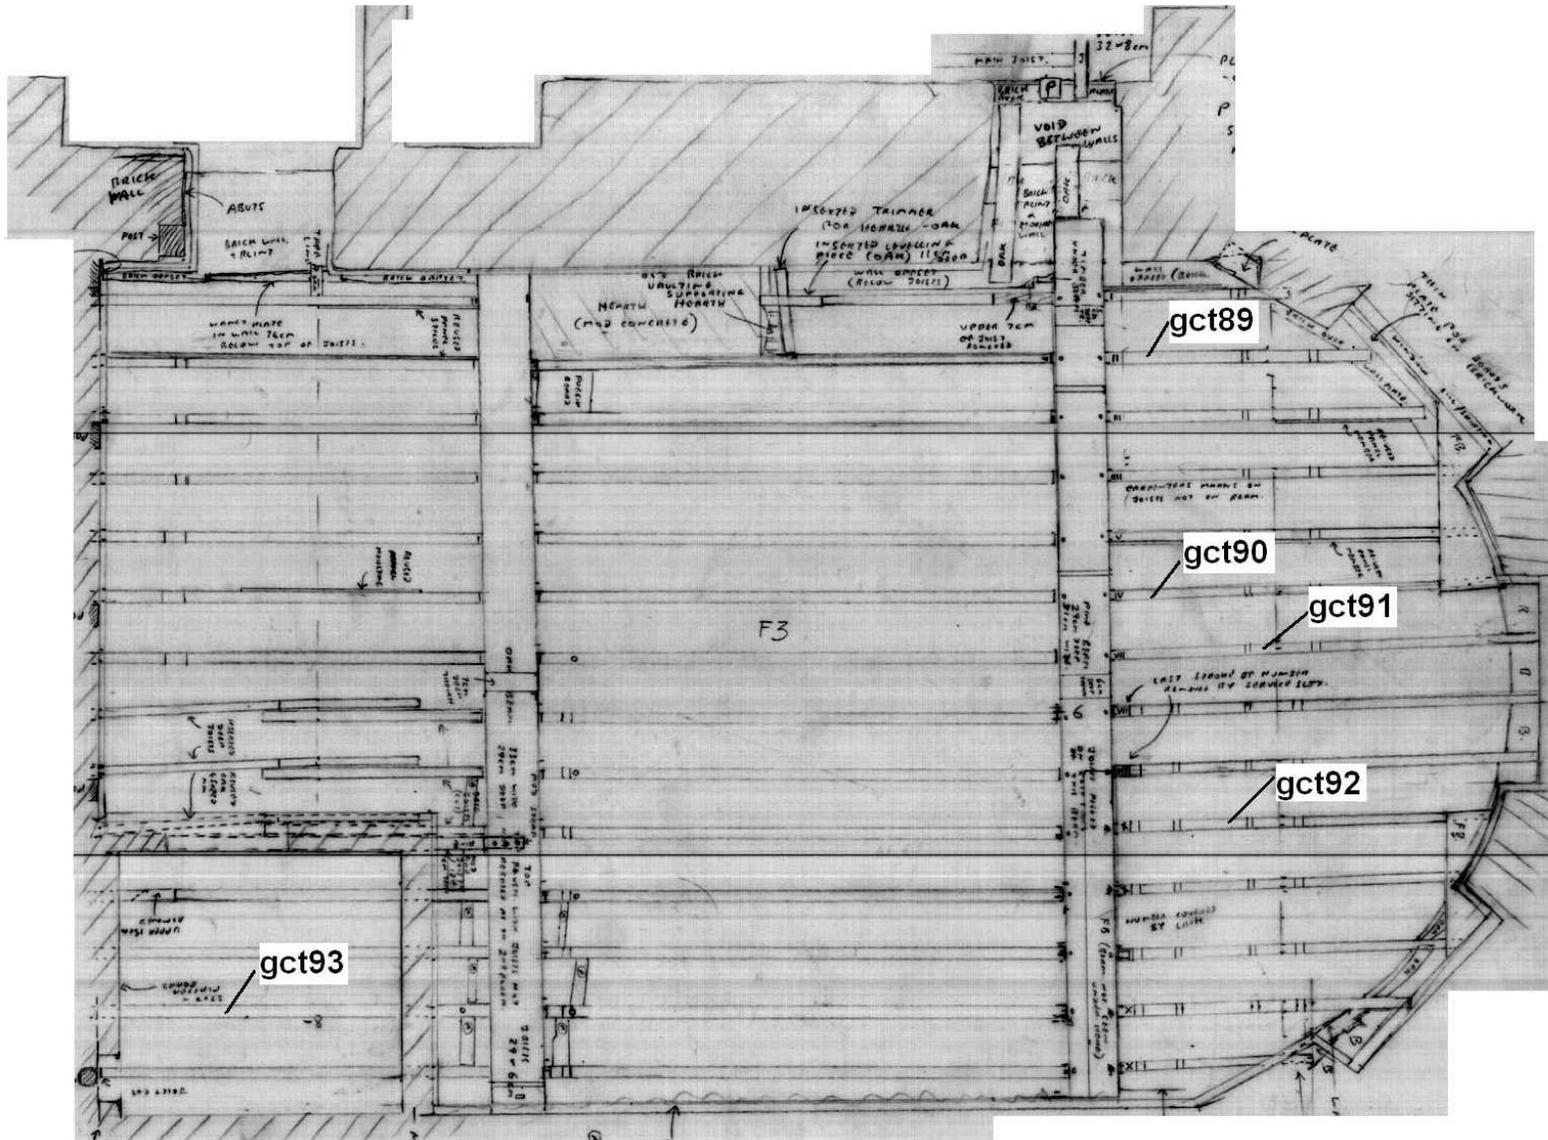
Room F3 floorplan, showing some of the timbers sampled for dendrochronology
